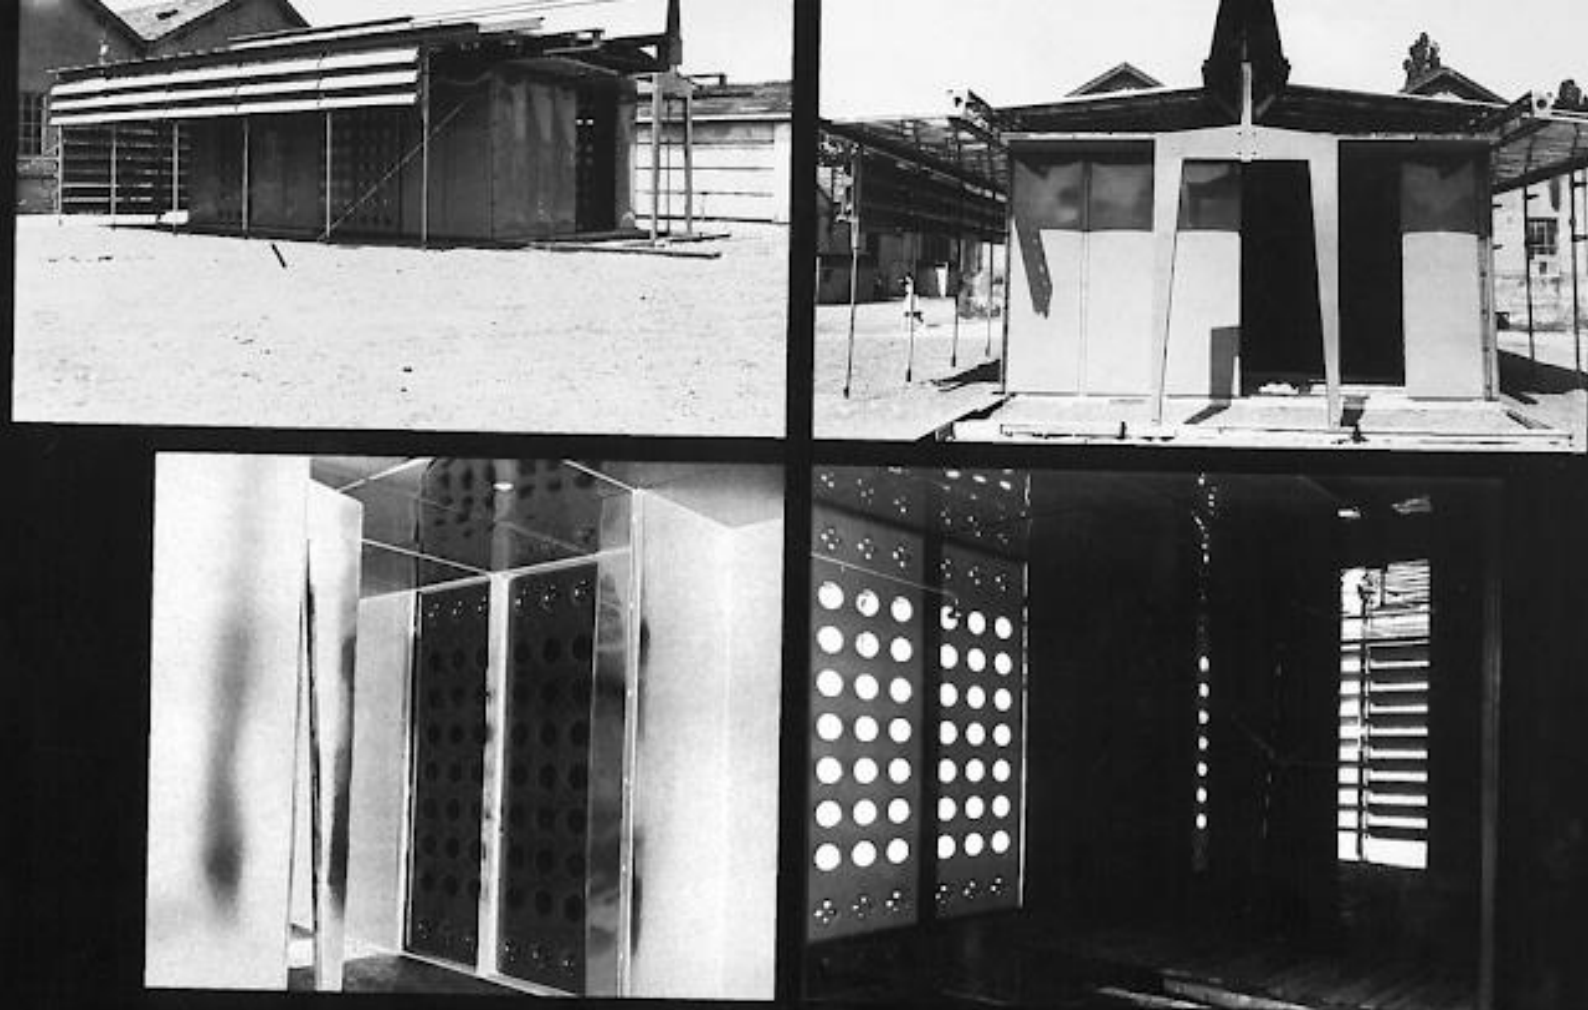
Series of imagery of La Maison Tropicale (a pavilion that demonstrated prefabrication construction system)
